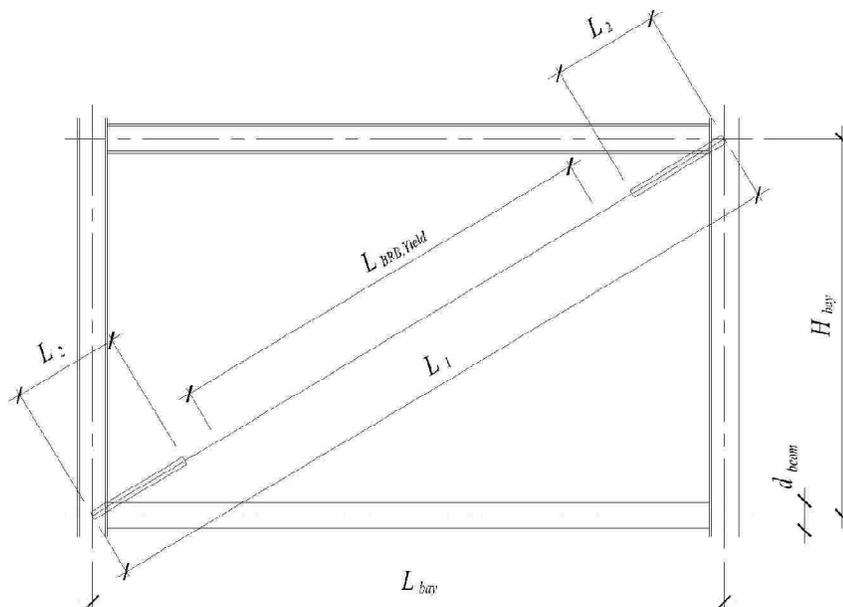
BRBF elevation view (Oxborrow, 2009)
